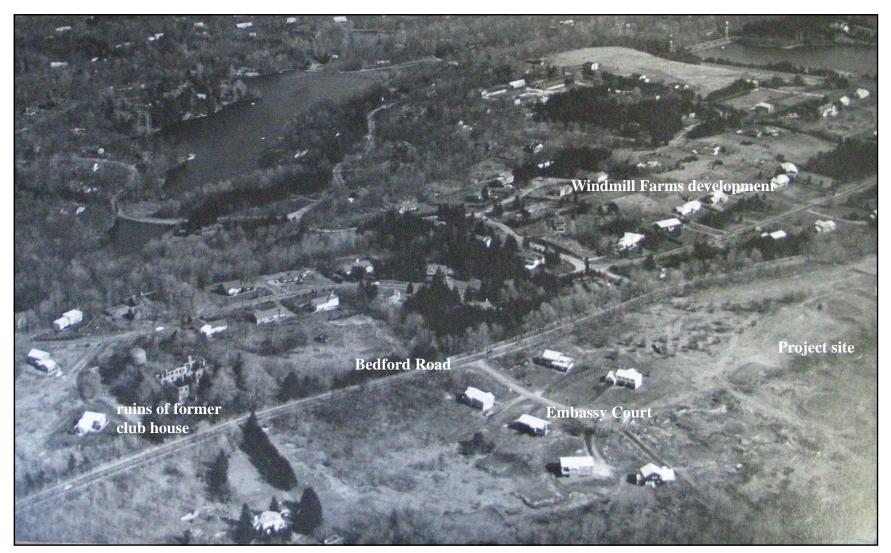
Aerial photograph showing northern portion of project site under construction in 1964.
